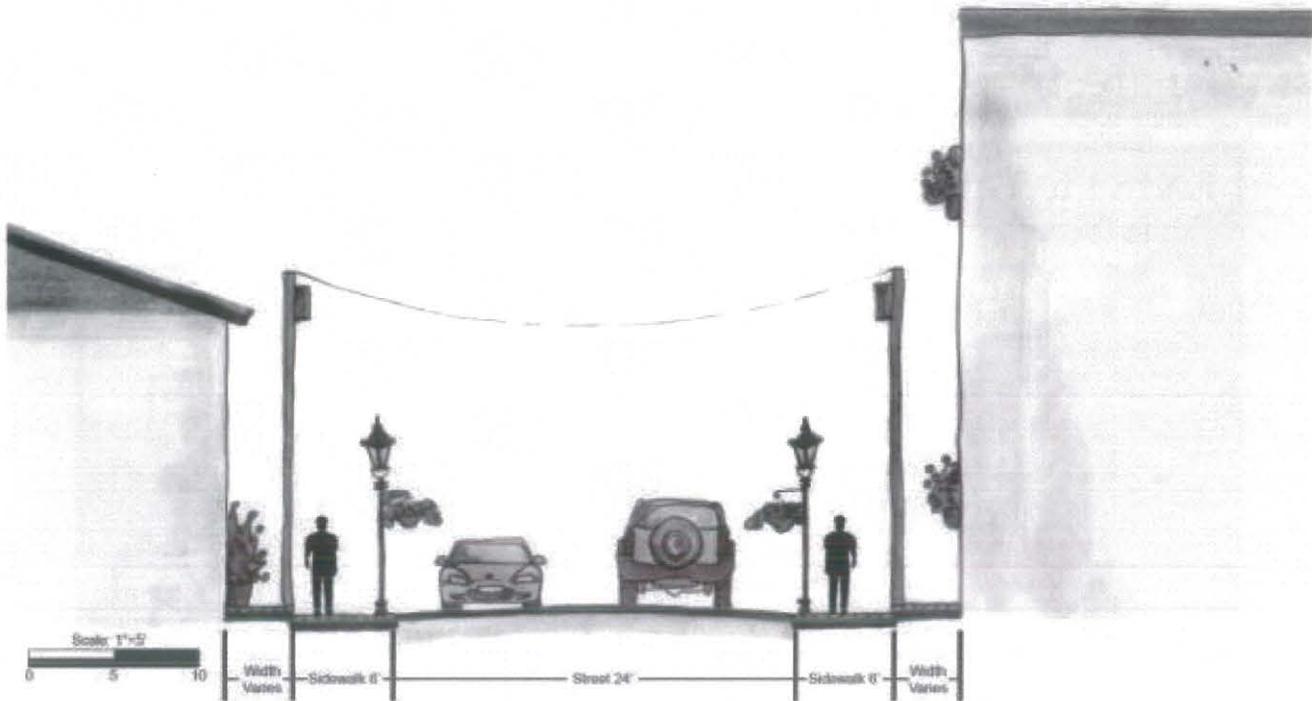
Proposed Plan for the Downtown Streets of Castroville
